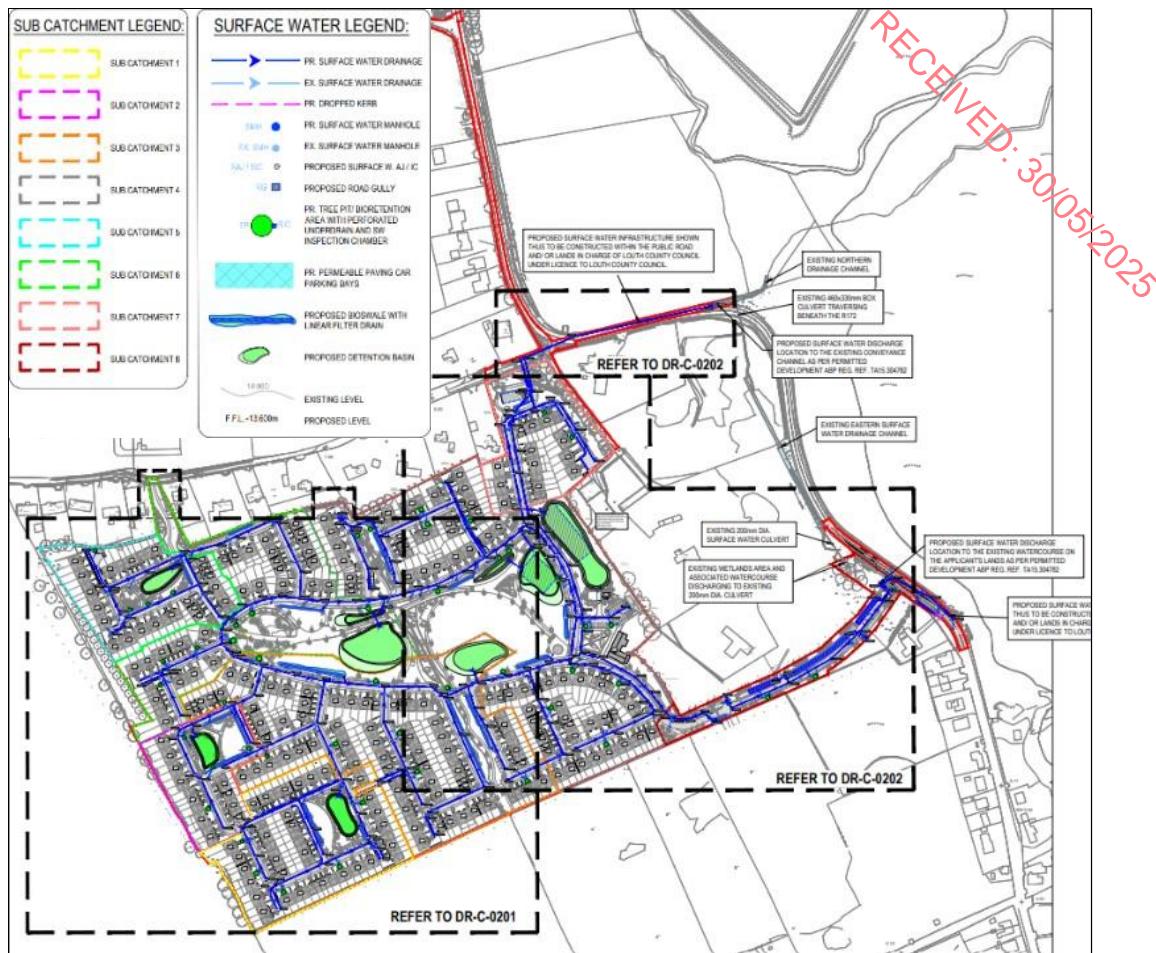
Proposed Surface Water Drainage Strategy (Extract from DOBA Drawing Pack, Drg. No. C-0200)
